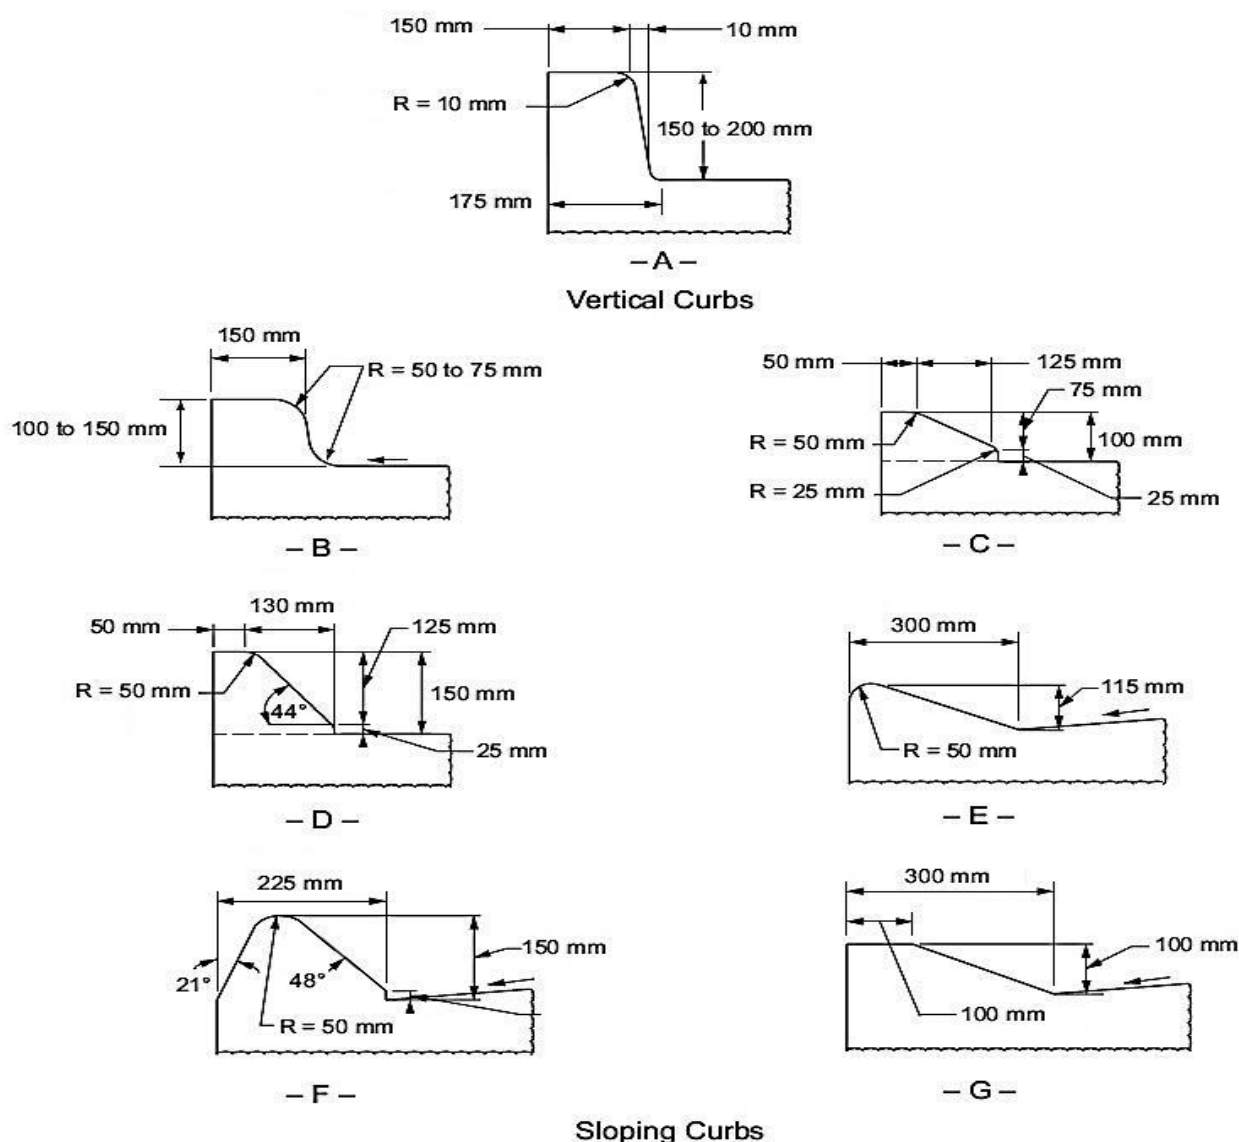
/1: Typical Highway Curbs [1, p. 4-17]
